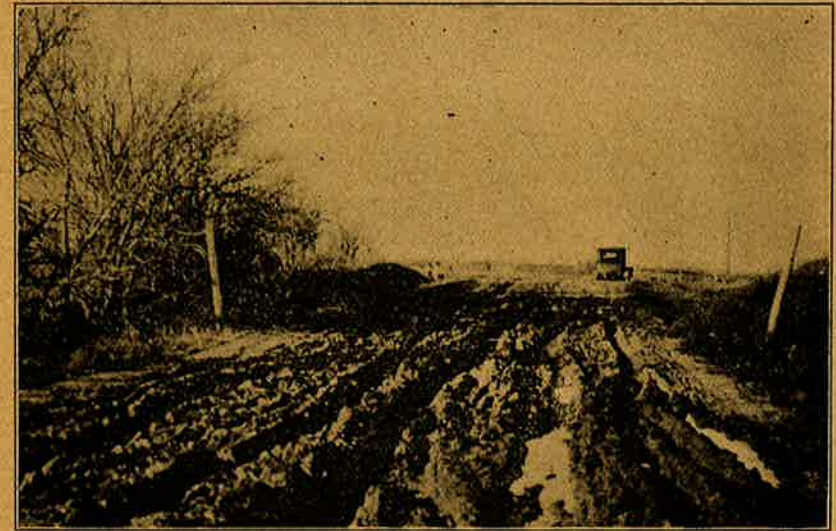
A Bad Road Resulting From Poor Cross Drainage. Photo by A. S. Merrick.
